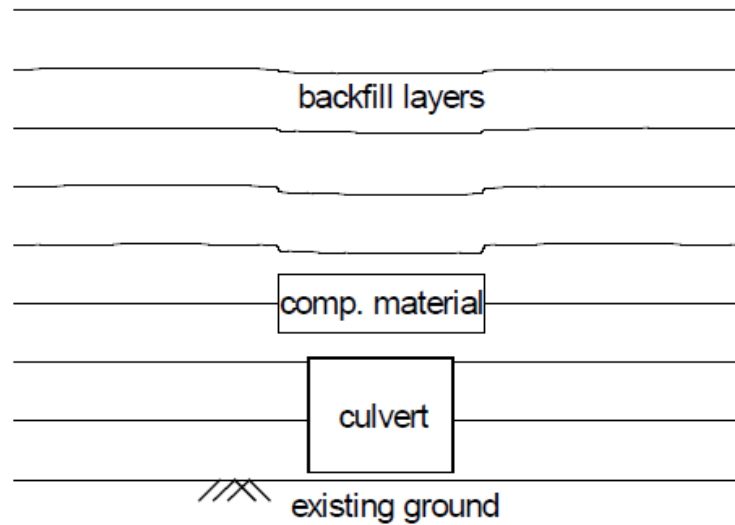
Embankment culvert (Lawson et al., 2010)
